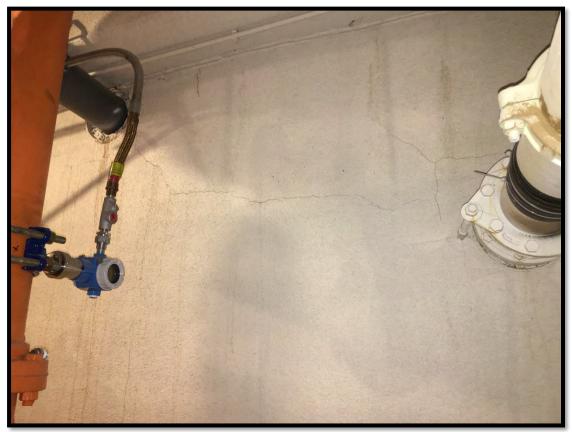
A&B, Aerobic Digester Basement Floor and Wall
